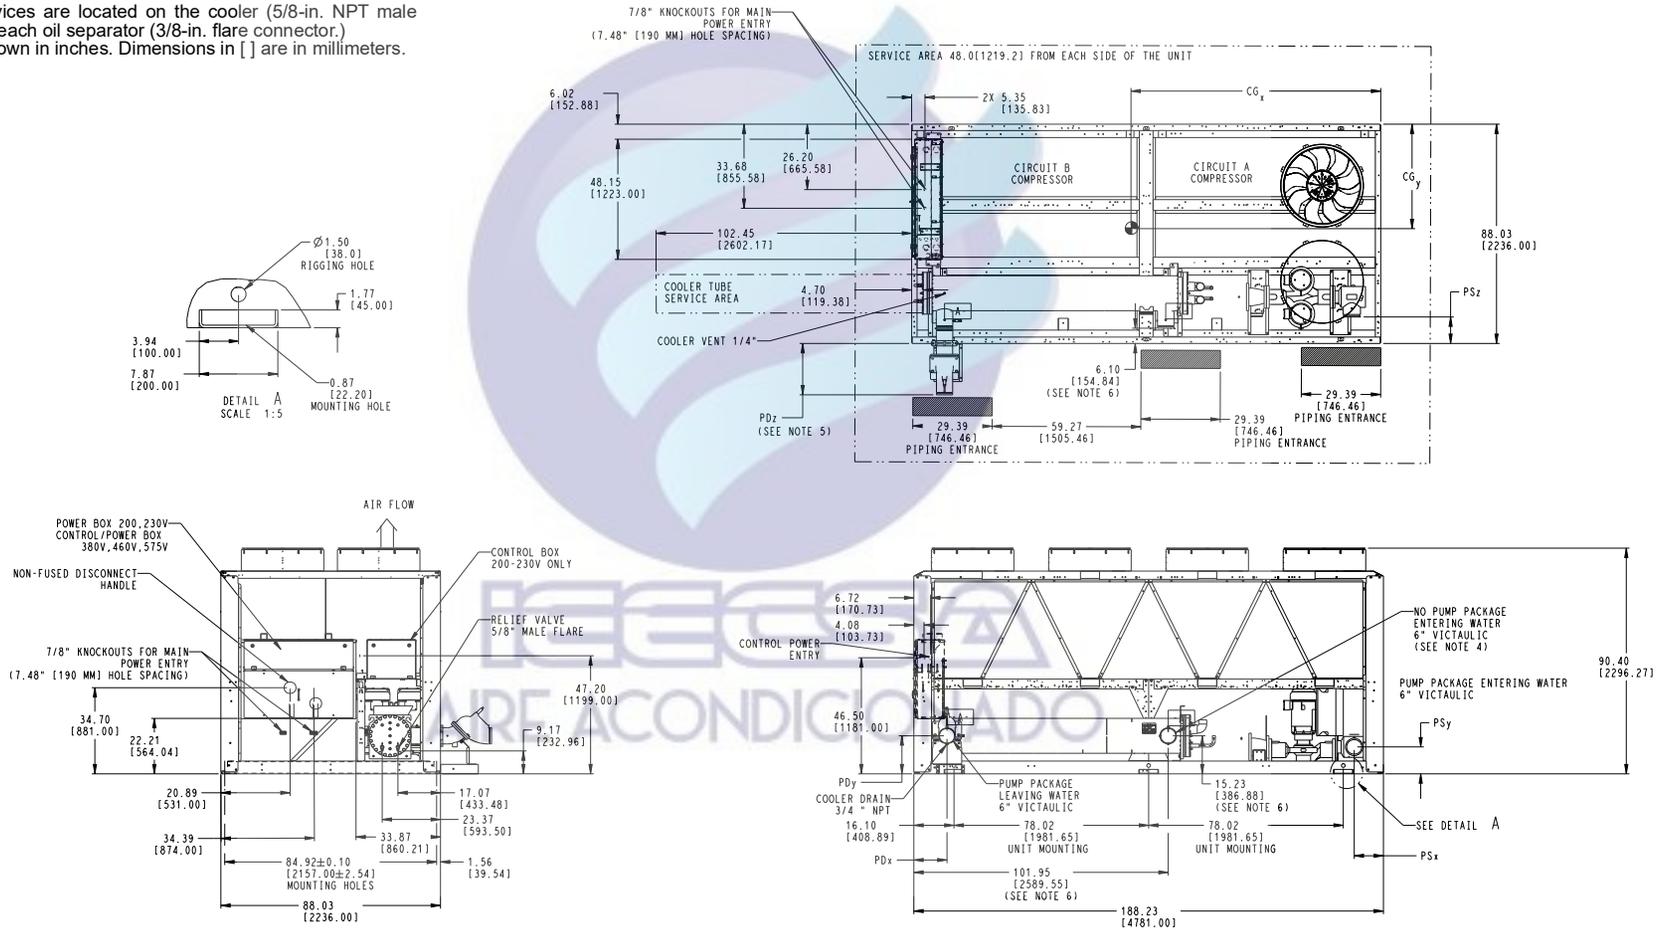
30XA112, 122 Air-Cooled Liquid Chiller Dimensions
